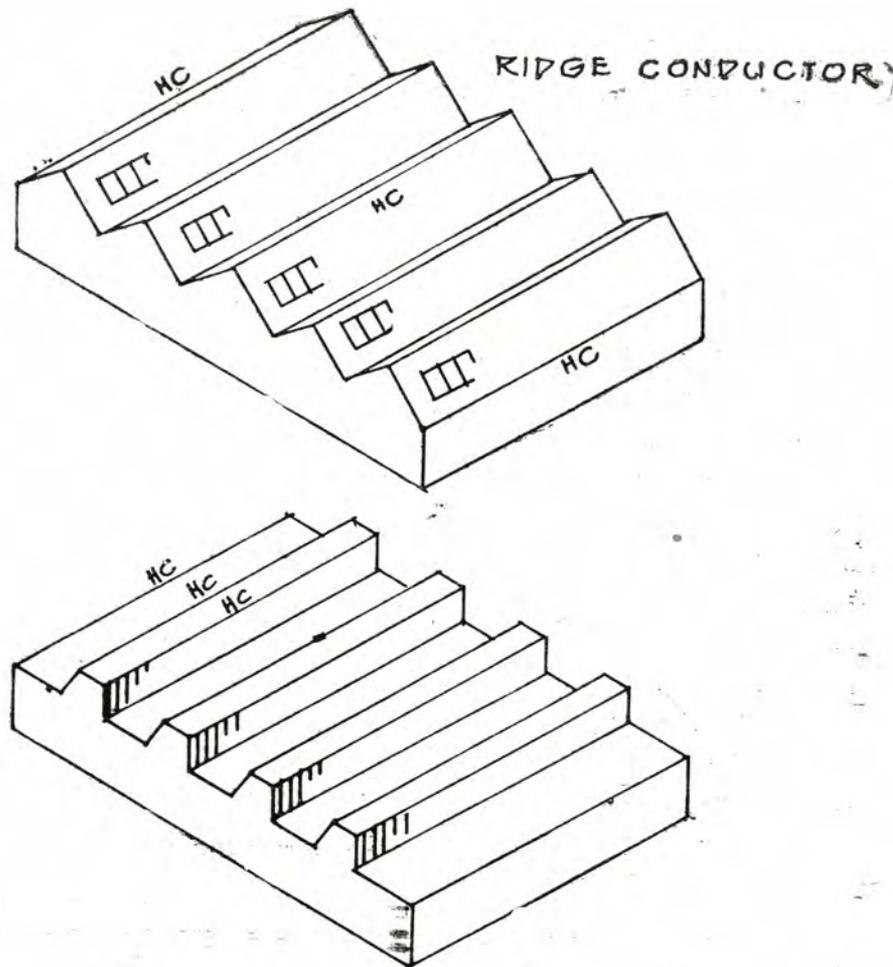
HORIZONTAL AIR TERMINATION NET WORK ON STRUCTURES WITH LARGE AREAS OF ROOF OF VARYING PROFILES.
